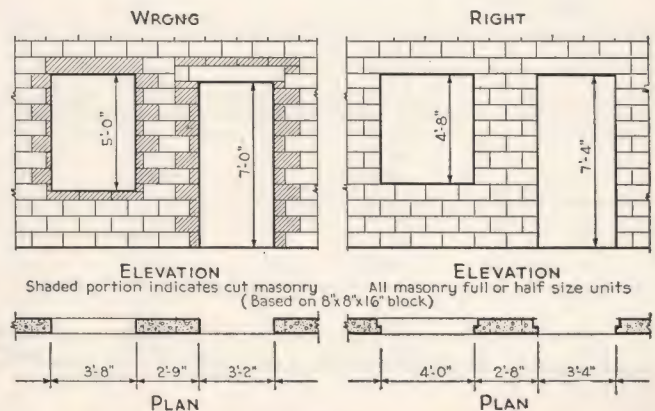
Examples of wrong and right planning of concrete masonry wall openings.
